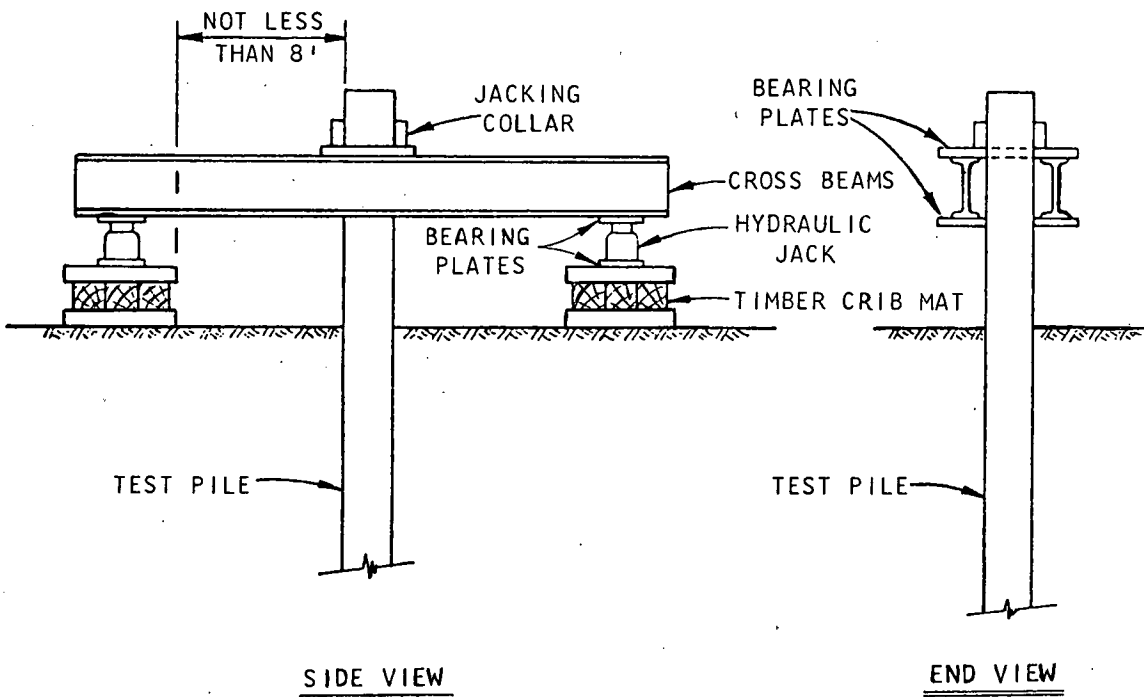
Typical setup for pile load testing in tension using cross-beams (214).
